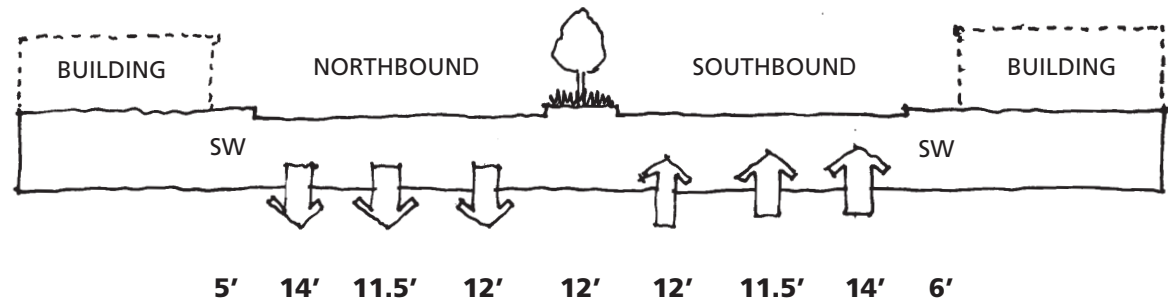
Street section in the north part of the study area, with the median added. View looking south.
